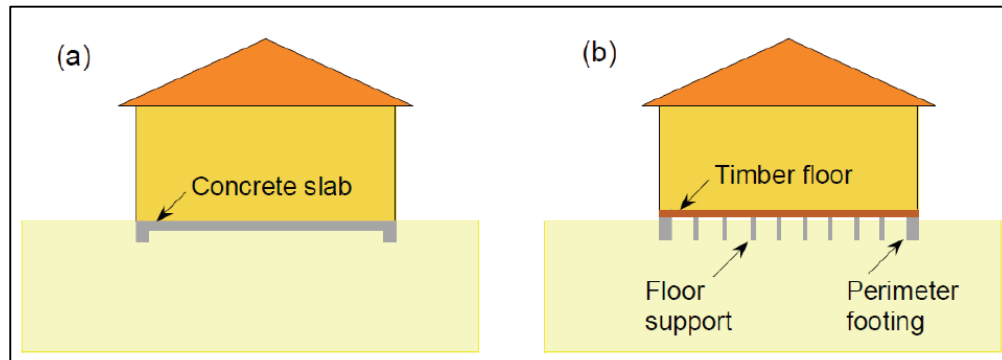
Prevalent house foundation types in Christchurch, New Zealand: (a) concrete slab, (b) perimeter footing (Cubrinovski et al. 2012)
